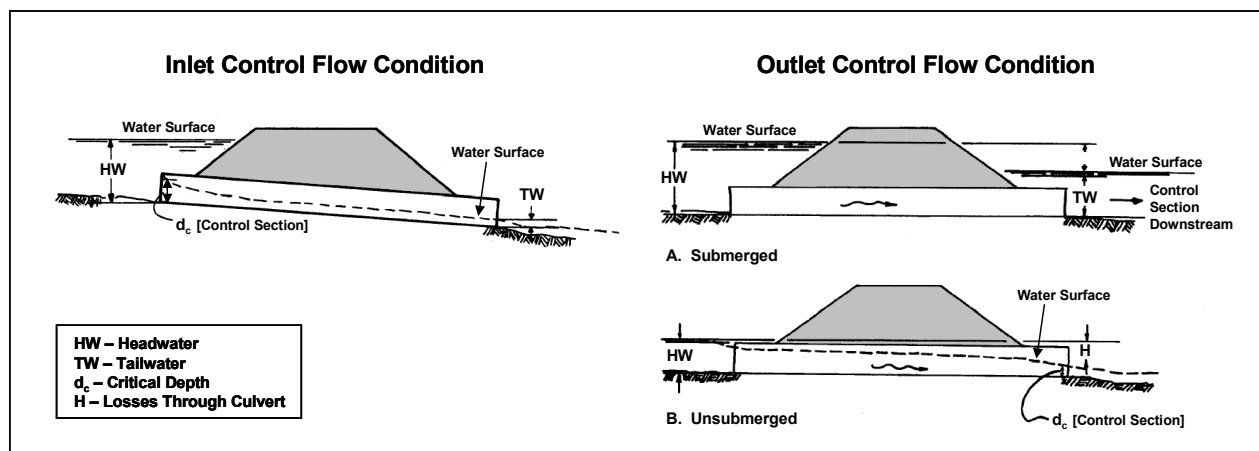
Culvert flow conditions (Adapted from: HDS-5, 1985).
